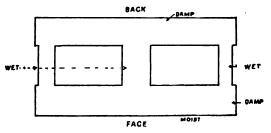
CONCRETE BLOCKS FOR HOUSES.
